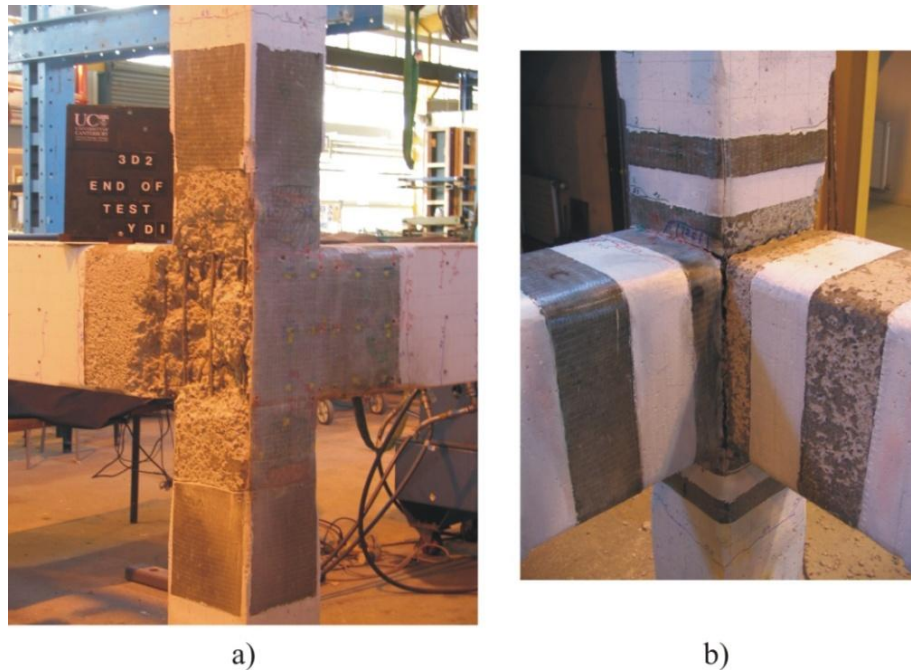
Damage state of Specimen 3D2 joint region after test under FRP sheet after test: a) outside view; b) inside view
